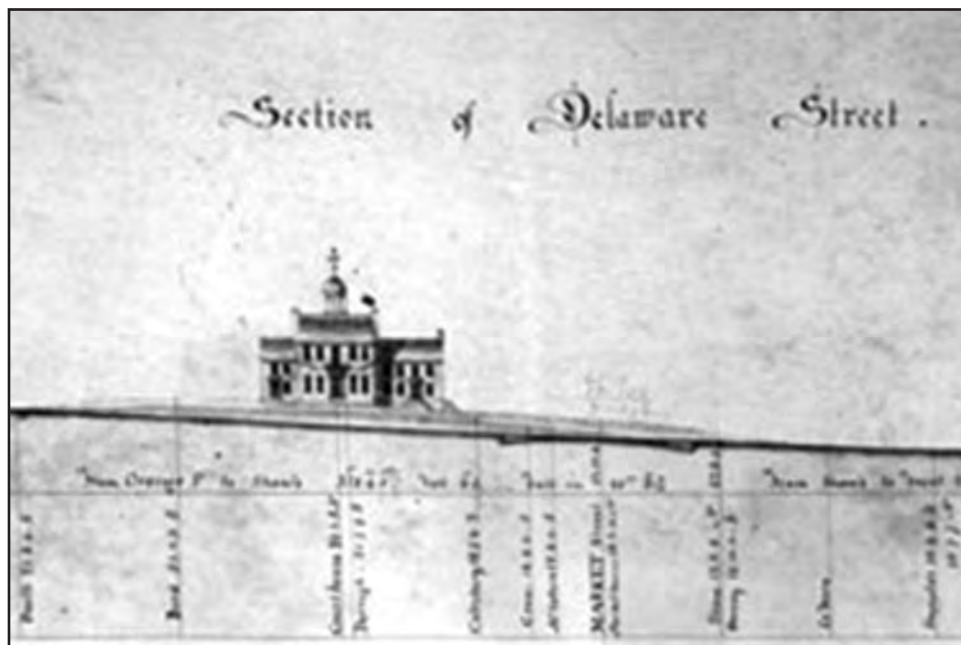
Detail, Latrobe's elevation drawing of Delaware Street (1804-05), showing the south façade of the Court House.
